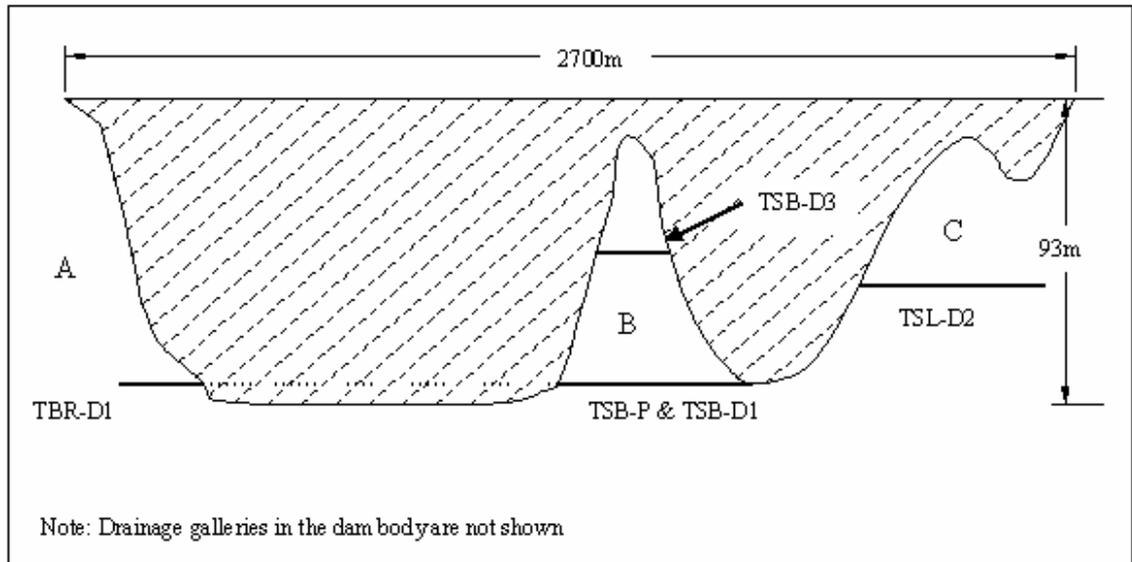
A long section of the dam showing the tunnel locations (upstream view)
